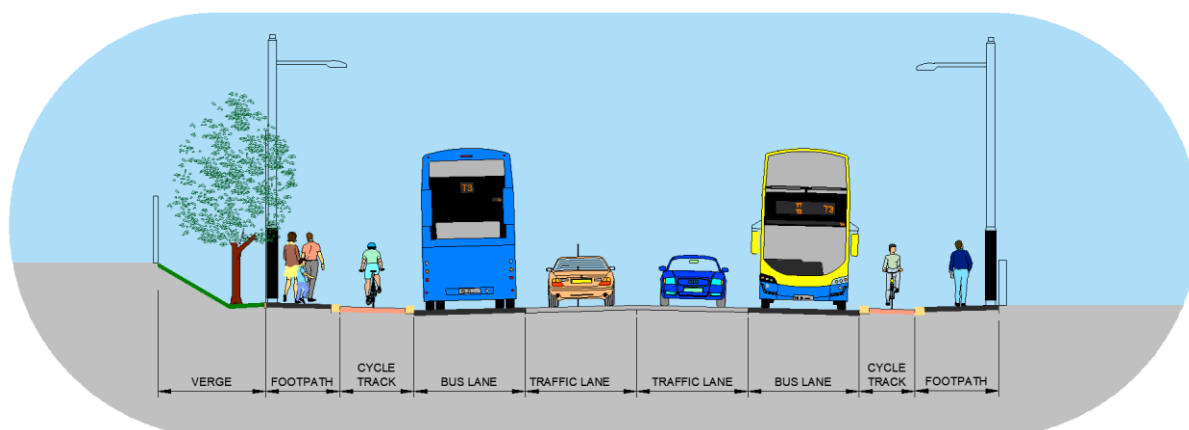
Typical CBC Cross Section Greenhills Road South of Mayberry Road
